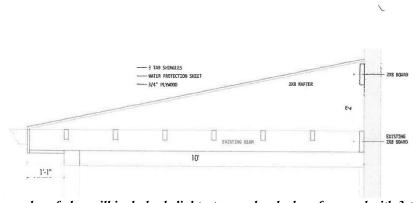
The proposed roof plan will include skylights, top, and a shed roof covered with 3-tab shingles.
